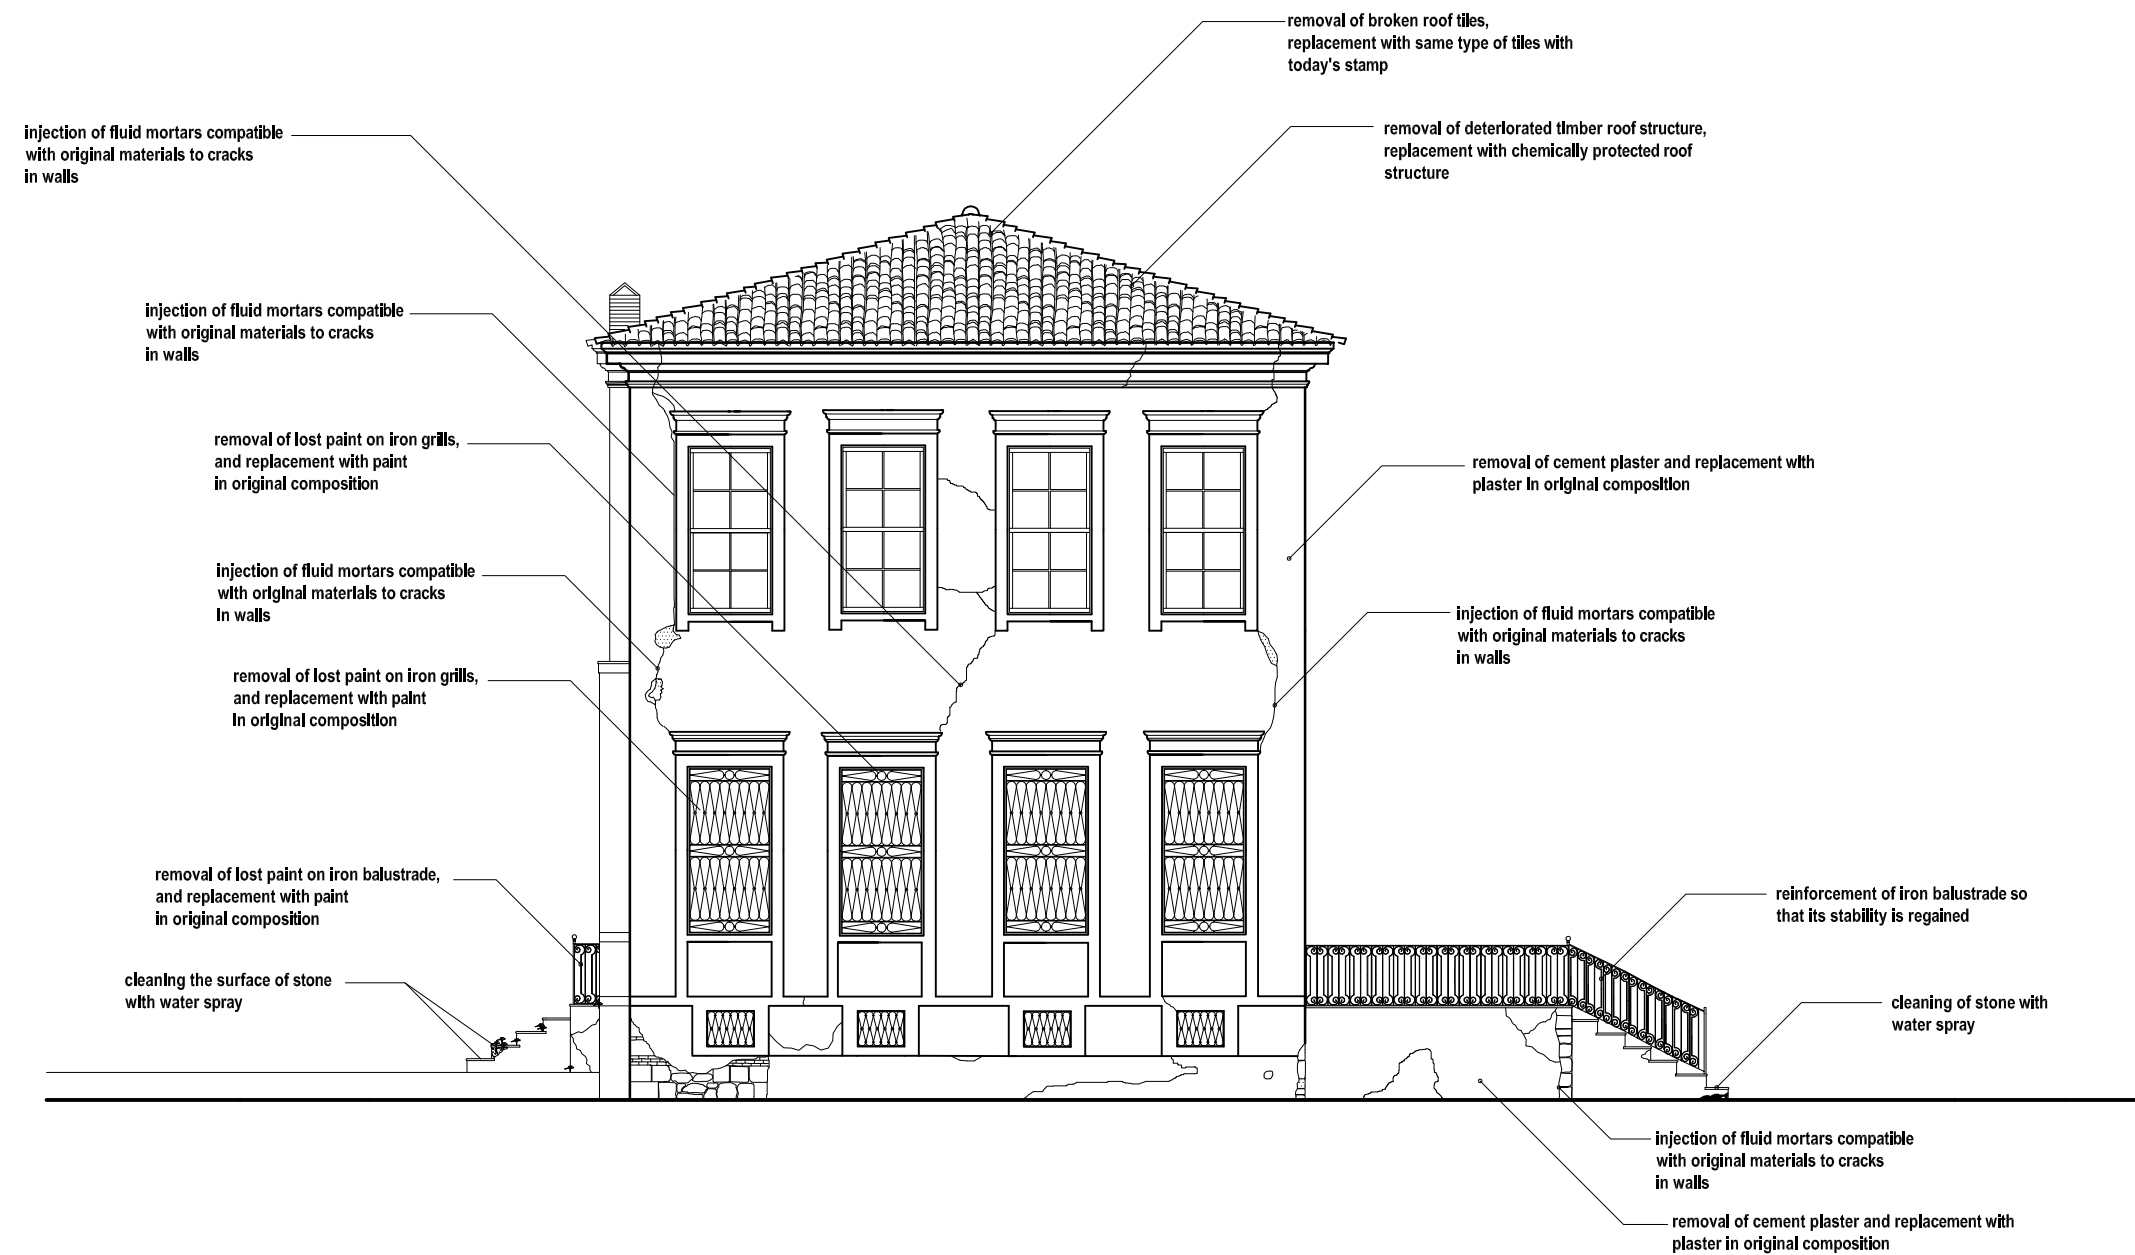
Remedial Measures for Structural Damage and Material Decay- Southern Elevation
